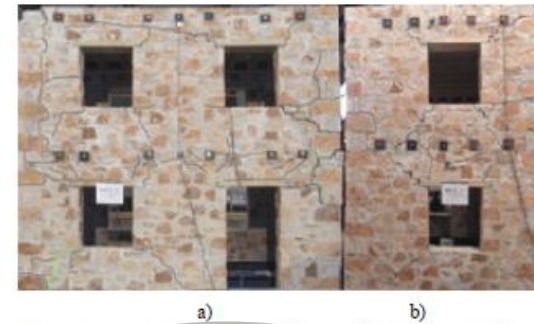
Strengthened model. Observed damages at a) the long wall 1 (LW1) and b) the short wall 2 (SW2); at 400%R of Irpinia earthquake
